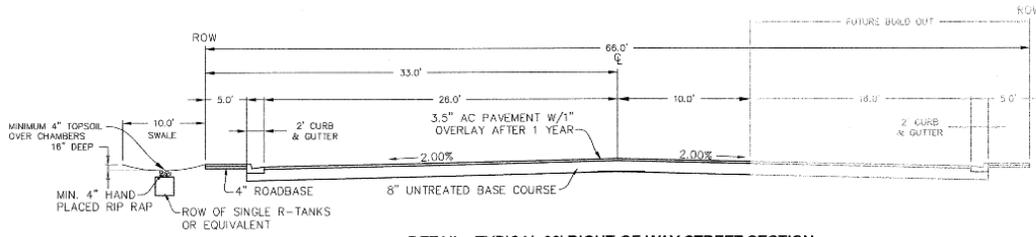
DETAIL - TYPICAL 66' RIGHT-OF-WAY STREET SECTION
